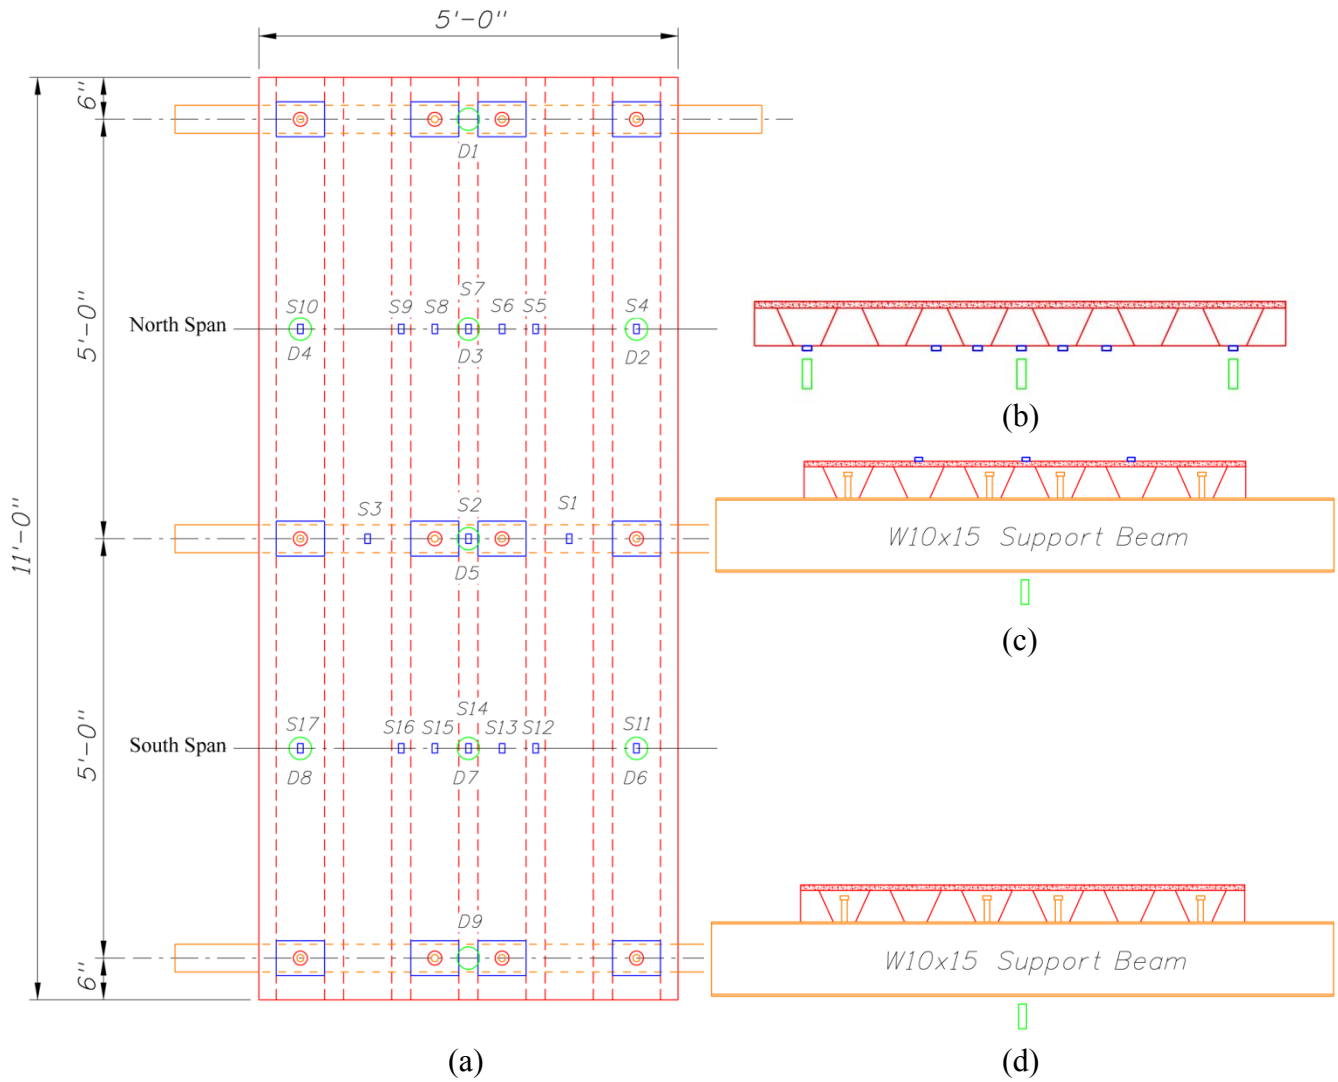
Instrumentation Plan: (a) Plan View; (b) Mid-Span; (c) Interior Support; and (d) Exterior Support
